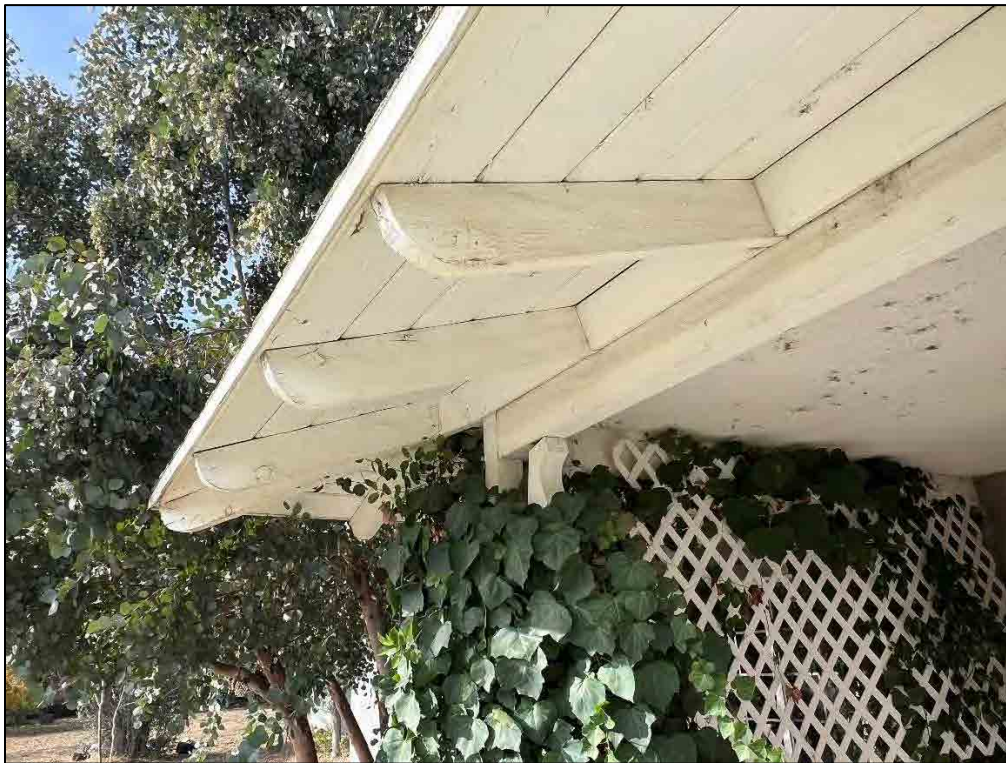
Detail view of the roof underside at the front entrance of the residence.
